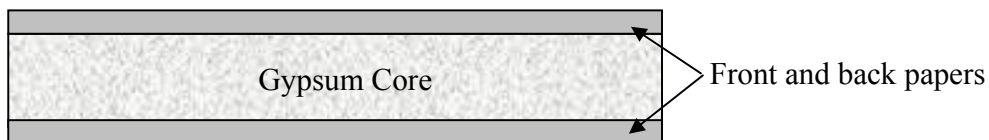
Gypsum wallboard or gypsum plasterboard
